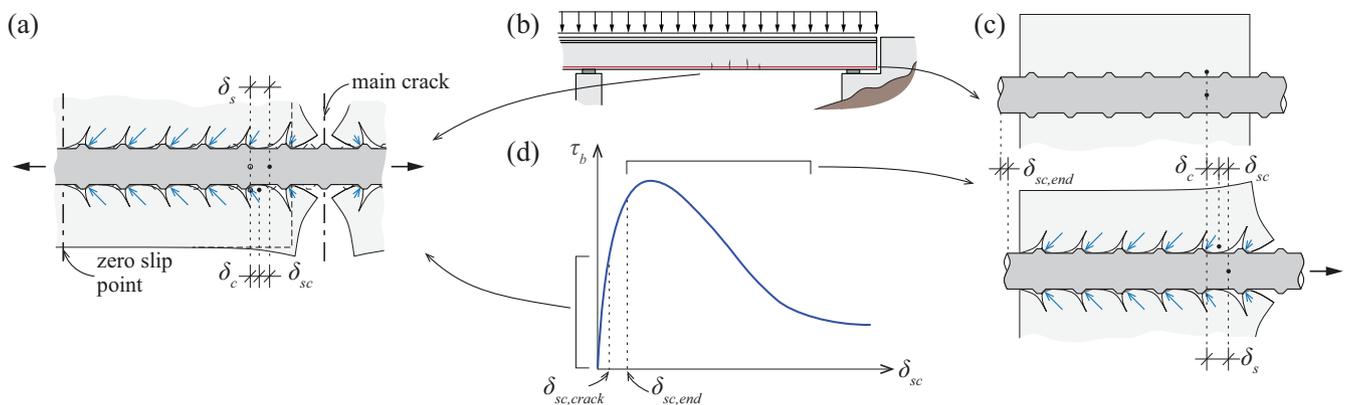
Bond in structural members; schematic representation of (a) a cracked region, (b) a reinforced concrete beam, and (c) an end anchorage; and (d) general bond–slip relationship.
